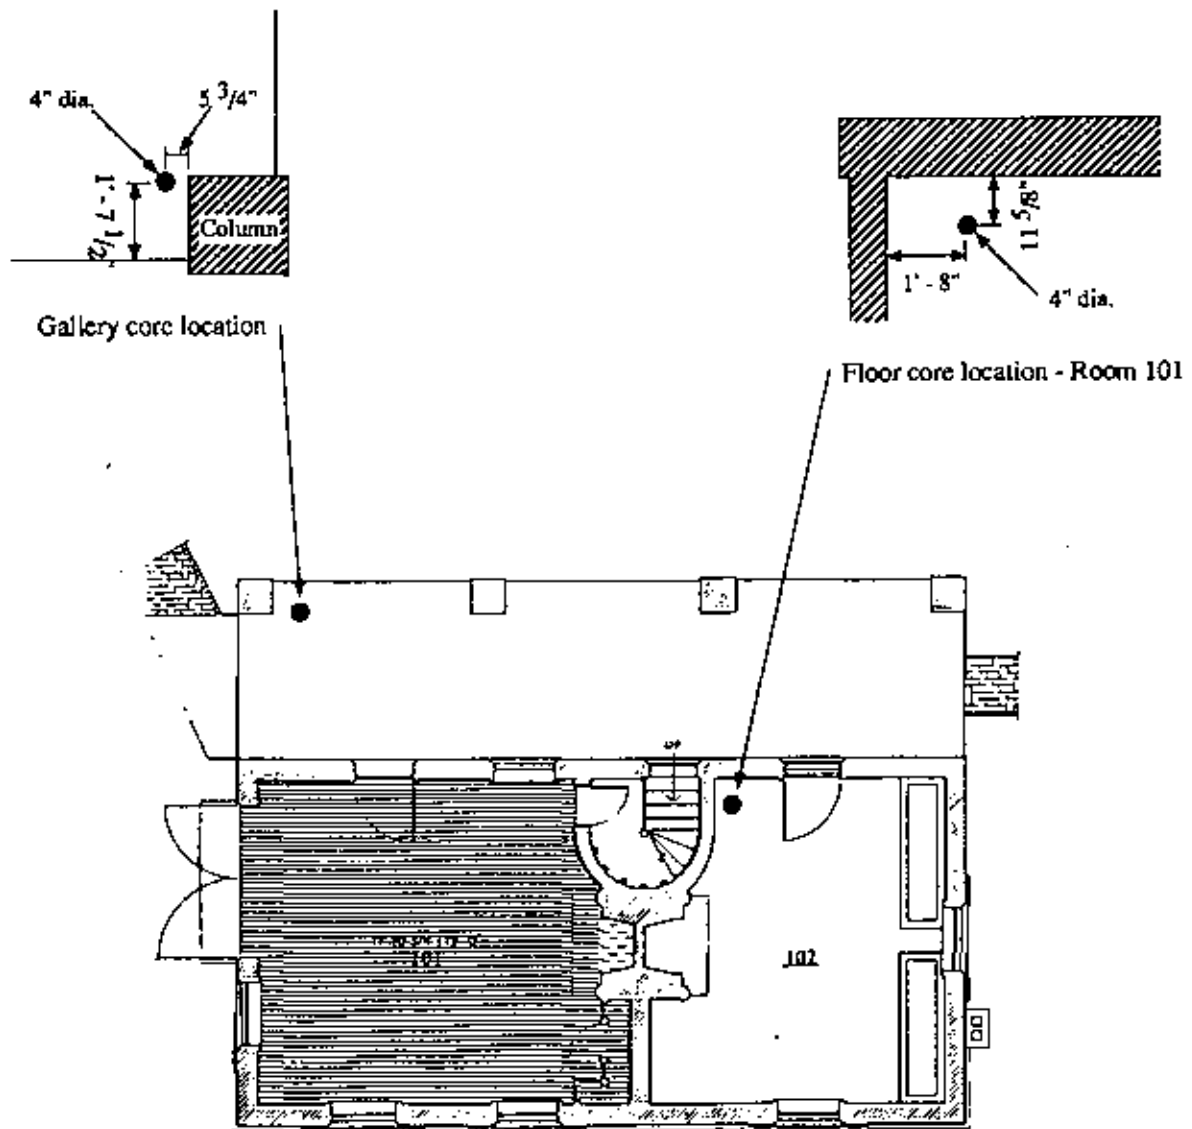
Melrose Dairy Building Plan - Location of Cores on Gallery and in Room 101
